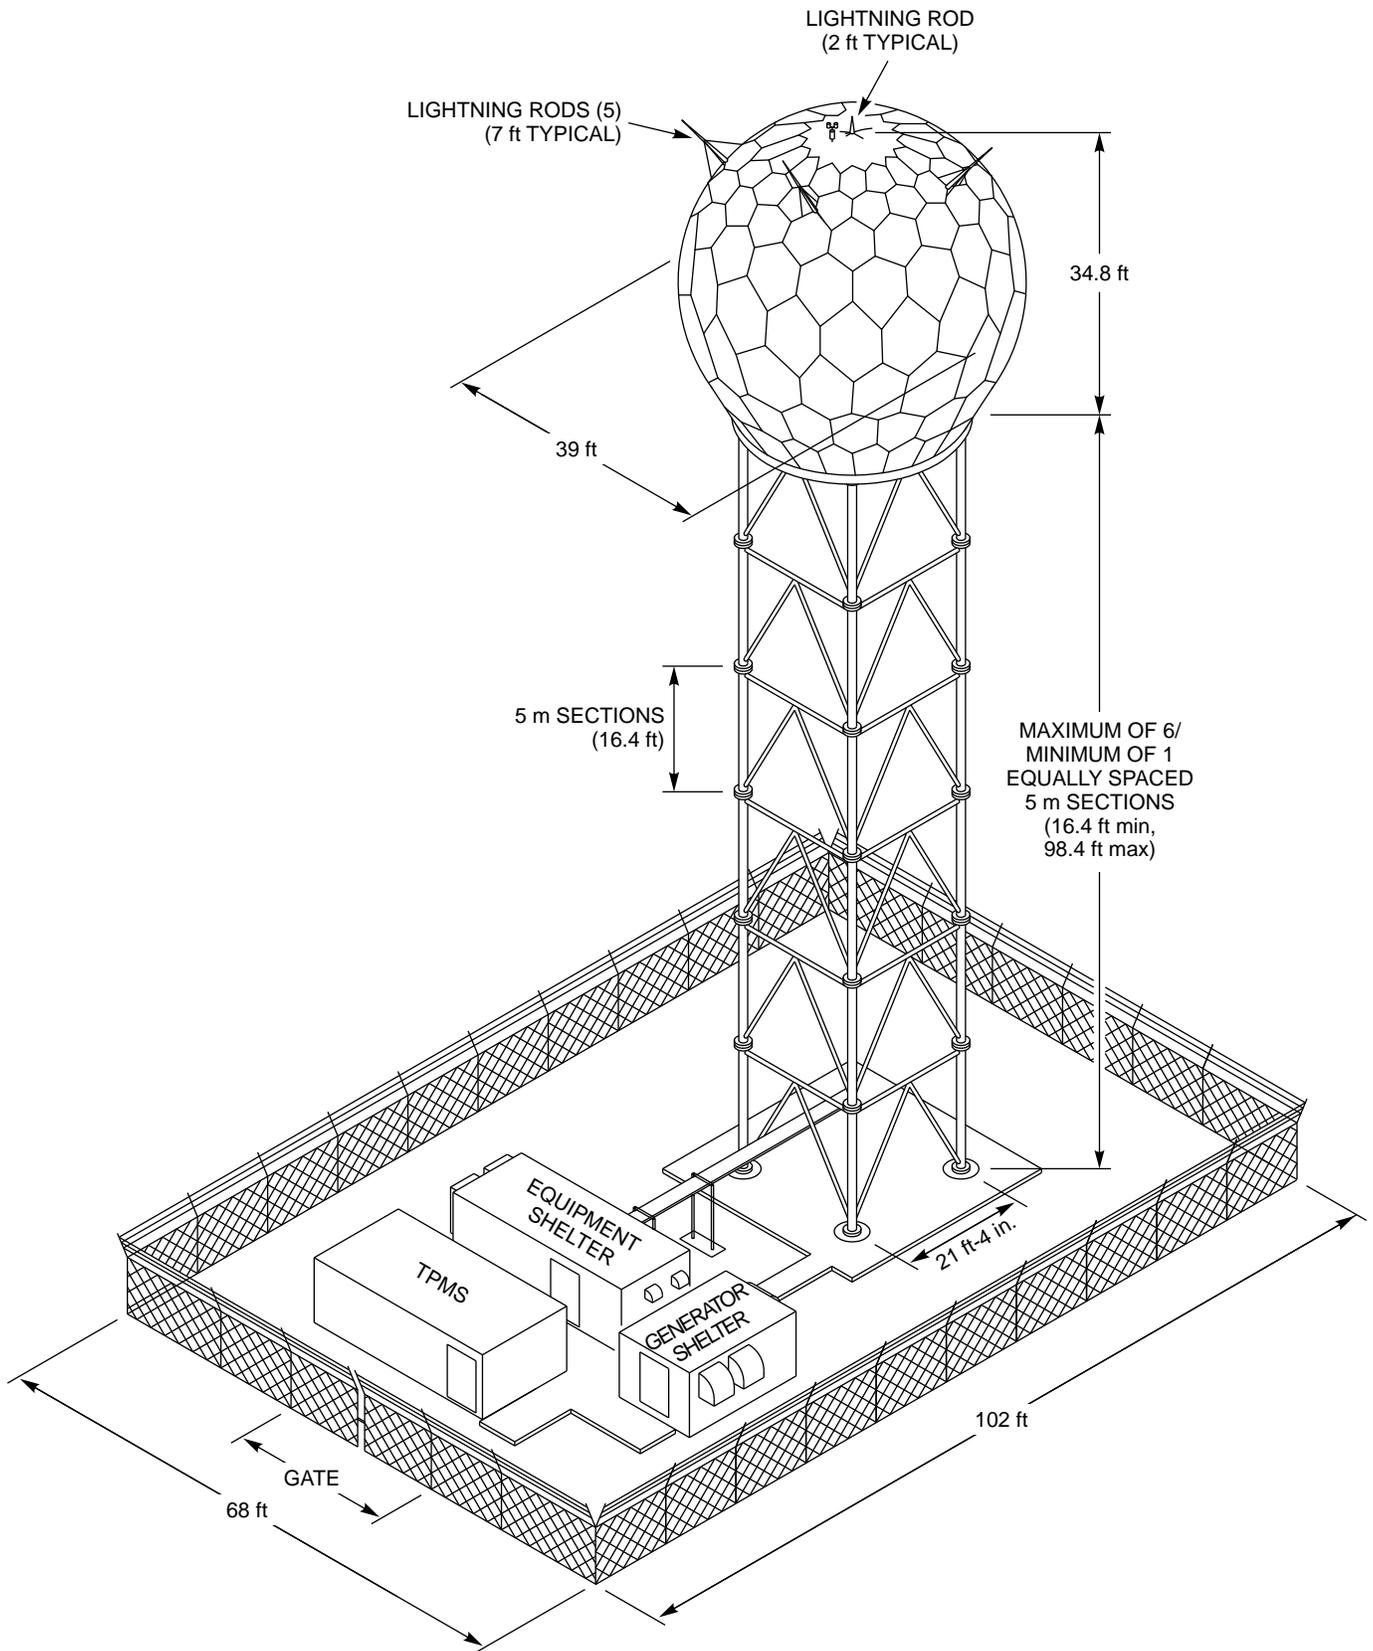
(b) STANDARD NWS NETWORK RADAR SITE LAYOUT
